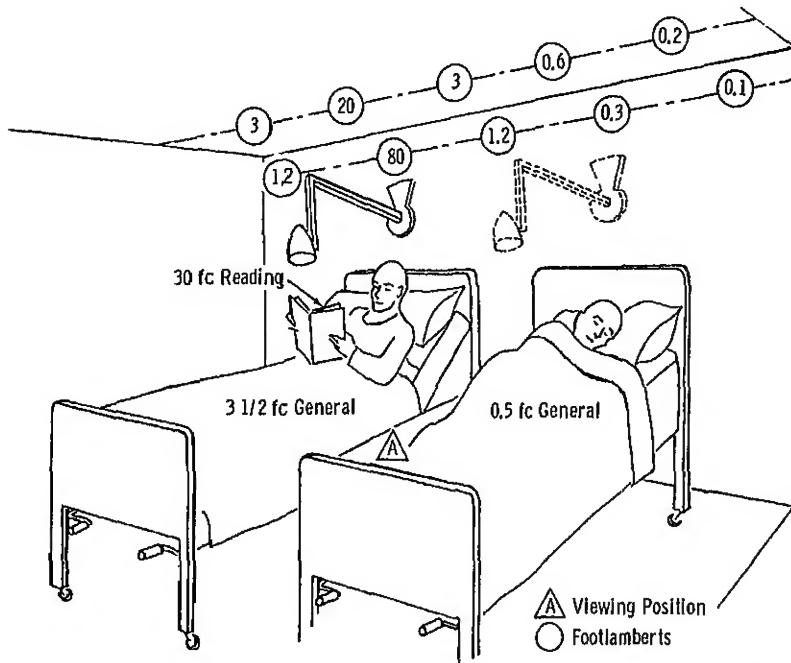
Wall-mounted bracket light with opaque shade, indirect lighting
